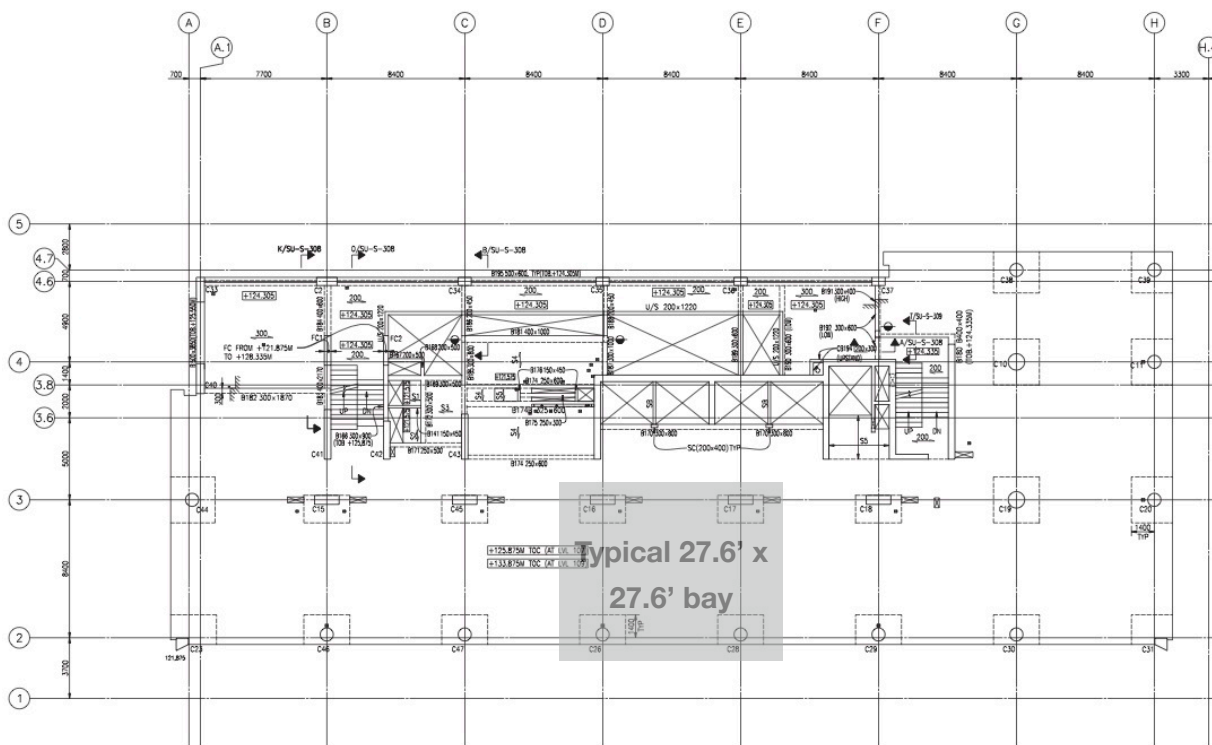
Typical Office Floor Plan. Highlighted portion shows typical bay to be analyzed
